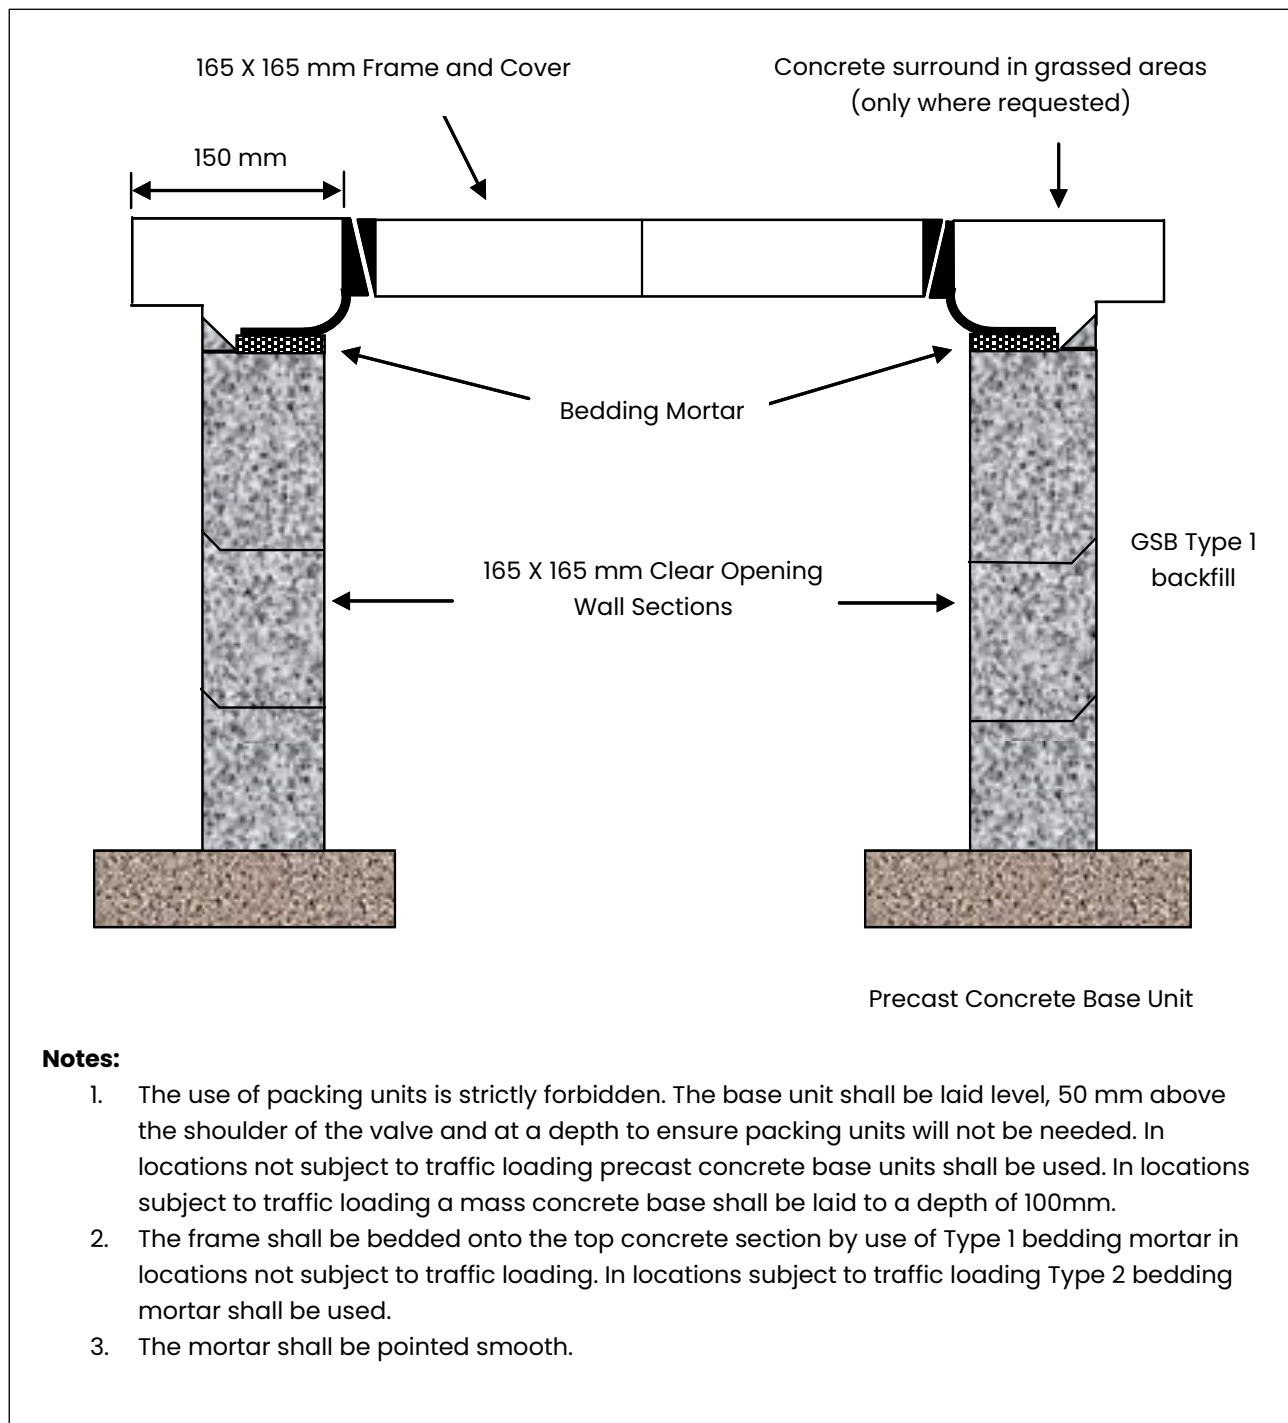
Precast Concrete Chamber with a 165 x 165 mm Frame and Cover
